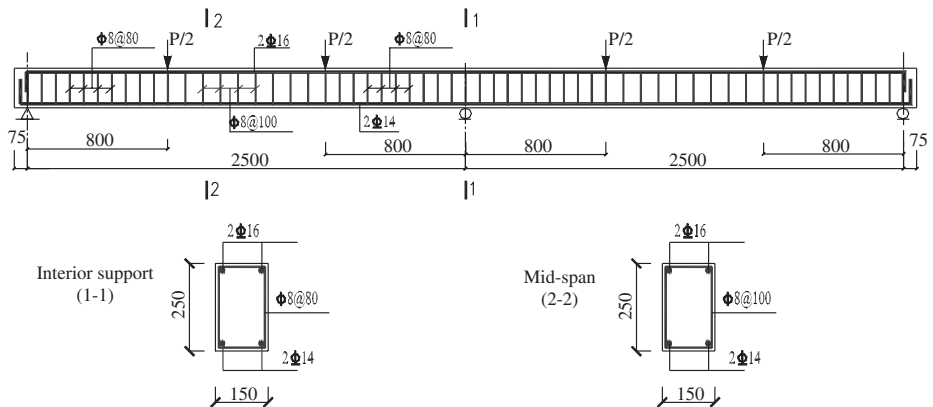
Test beam elevation and cross-sectional details (all dimensions in mm).
